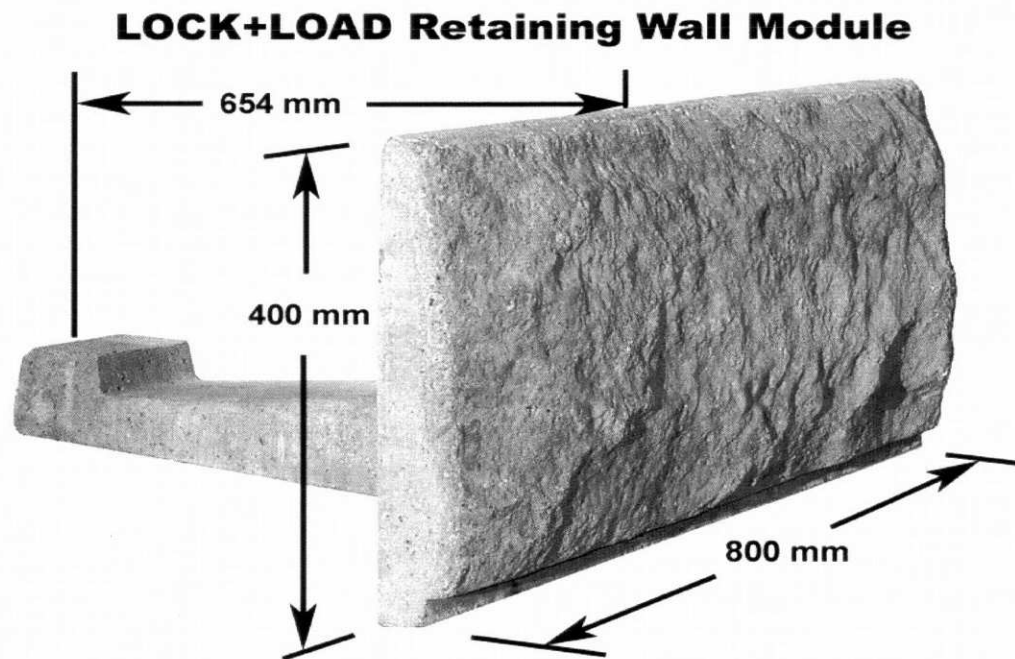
Photograph showing the dimensions of a Lock + Load retaining wall module.
